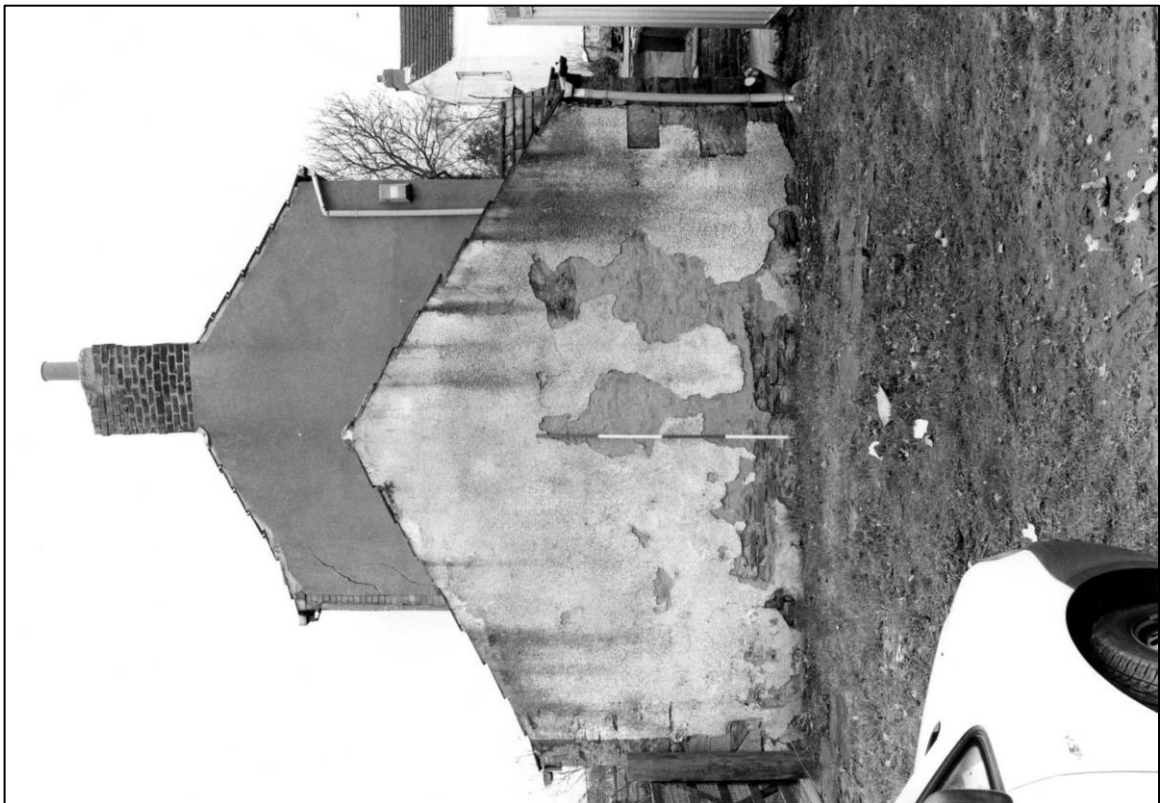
Barn Cottage range, N gable, looking S (photo 3/15) (top to left).
